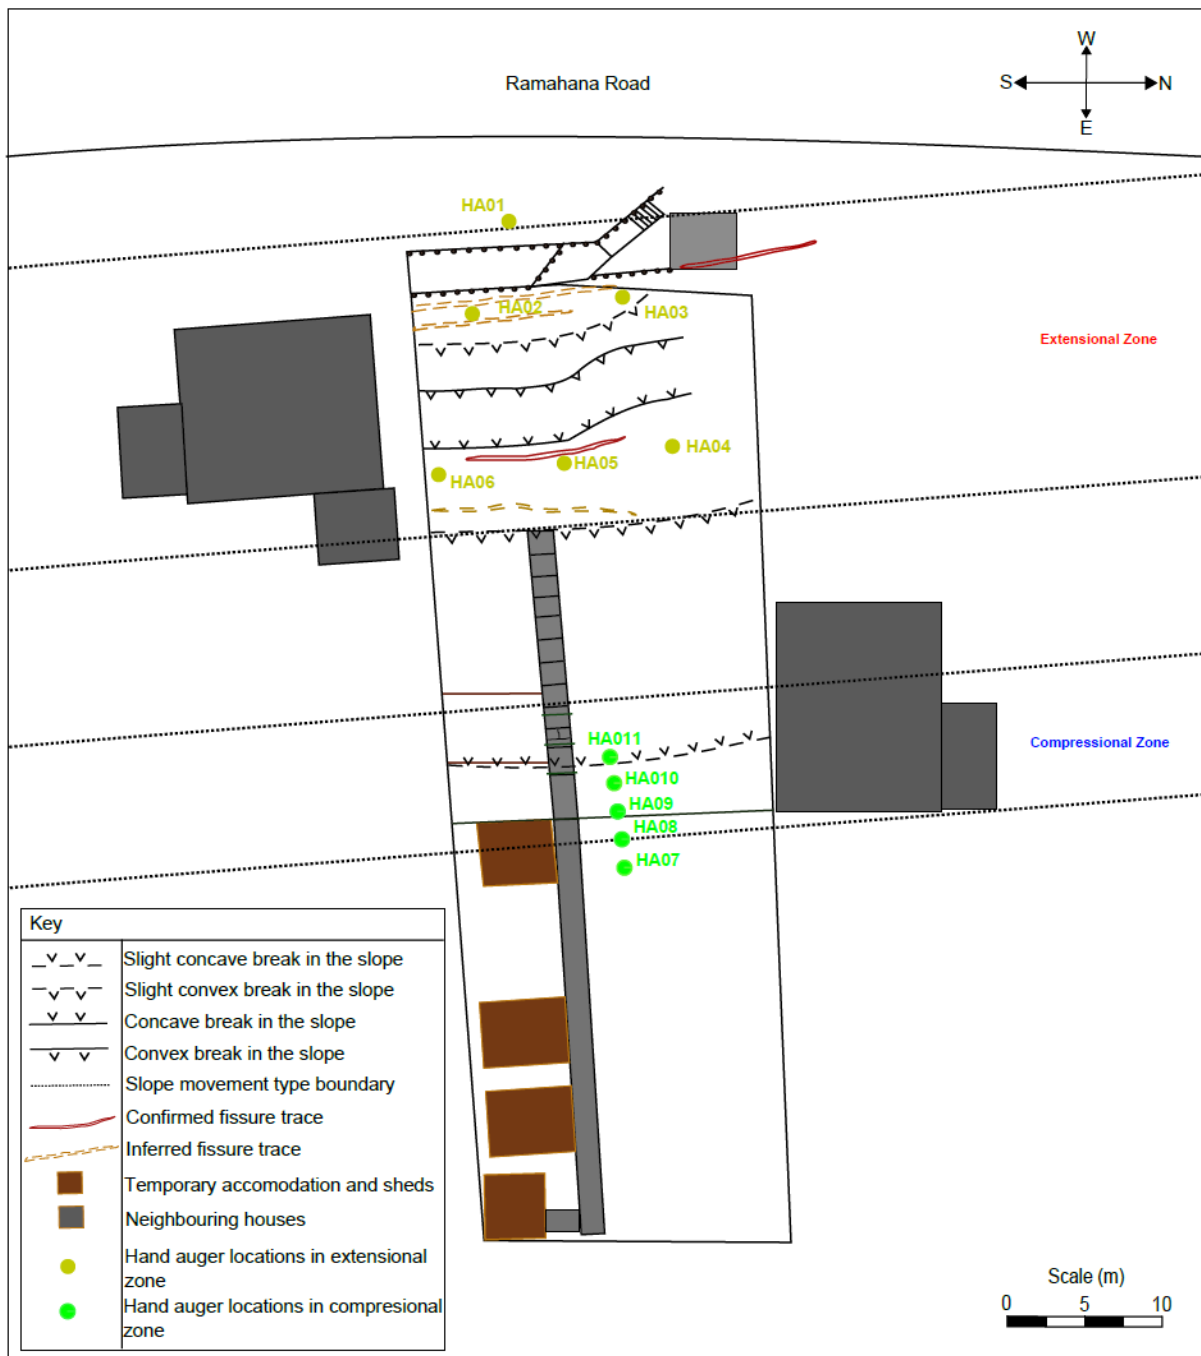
Hand auger and DCP locations at 17 Ramahana Road as part of geotechnical appraisal and testing the compressional zone at the site.
